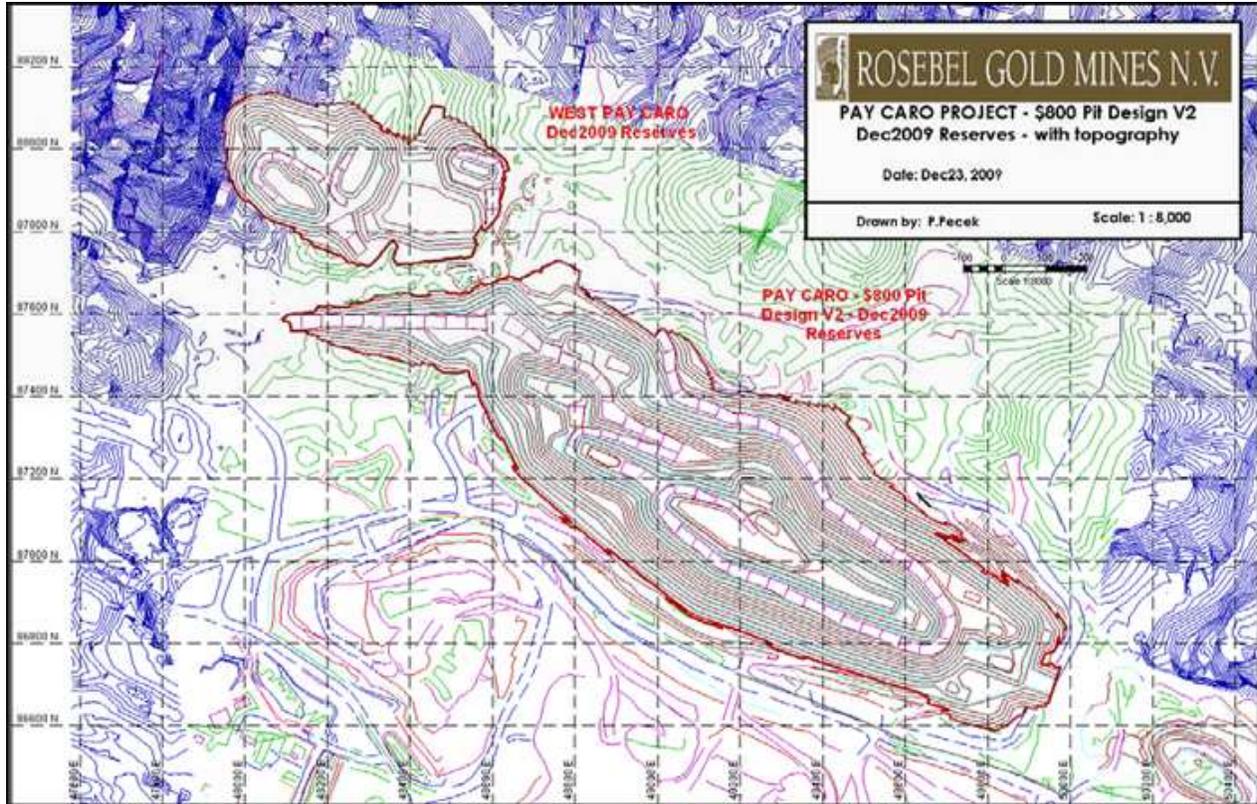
Pay Caro pit design (Main Pit and West Pay Caro).
